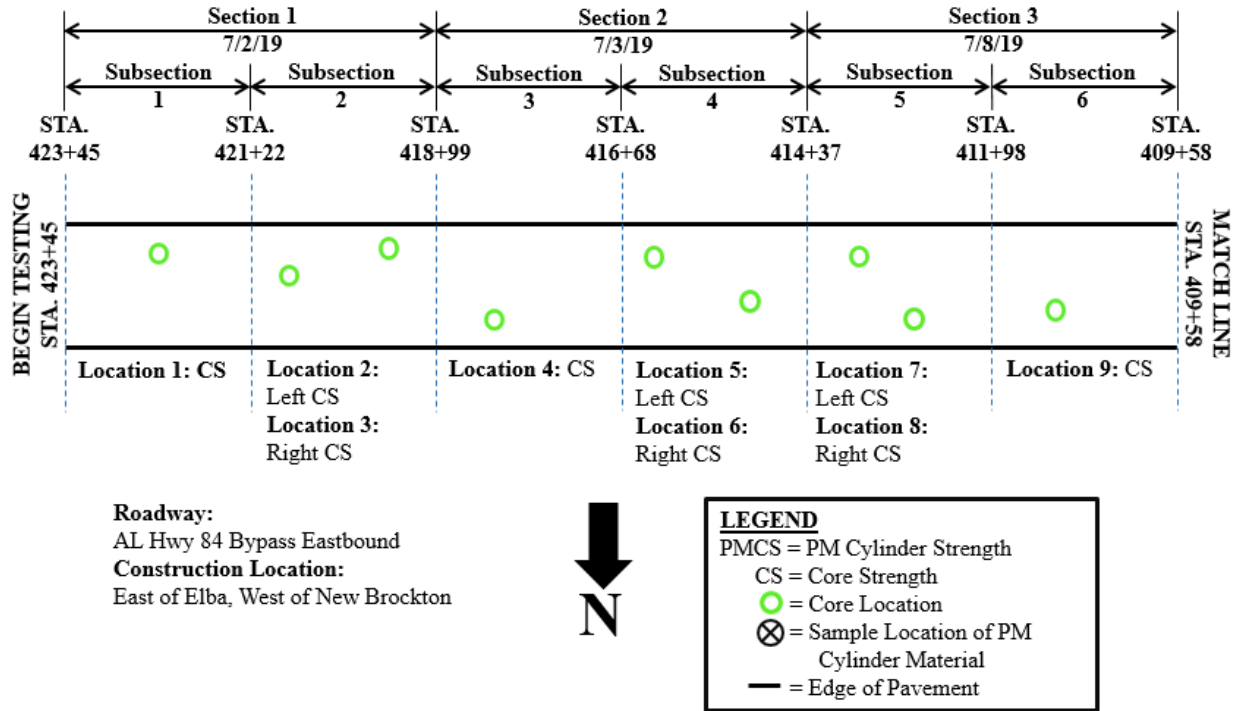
Subsection layout for Station 423+45 to Station 409+58
